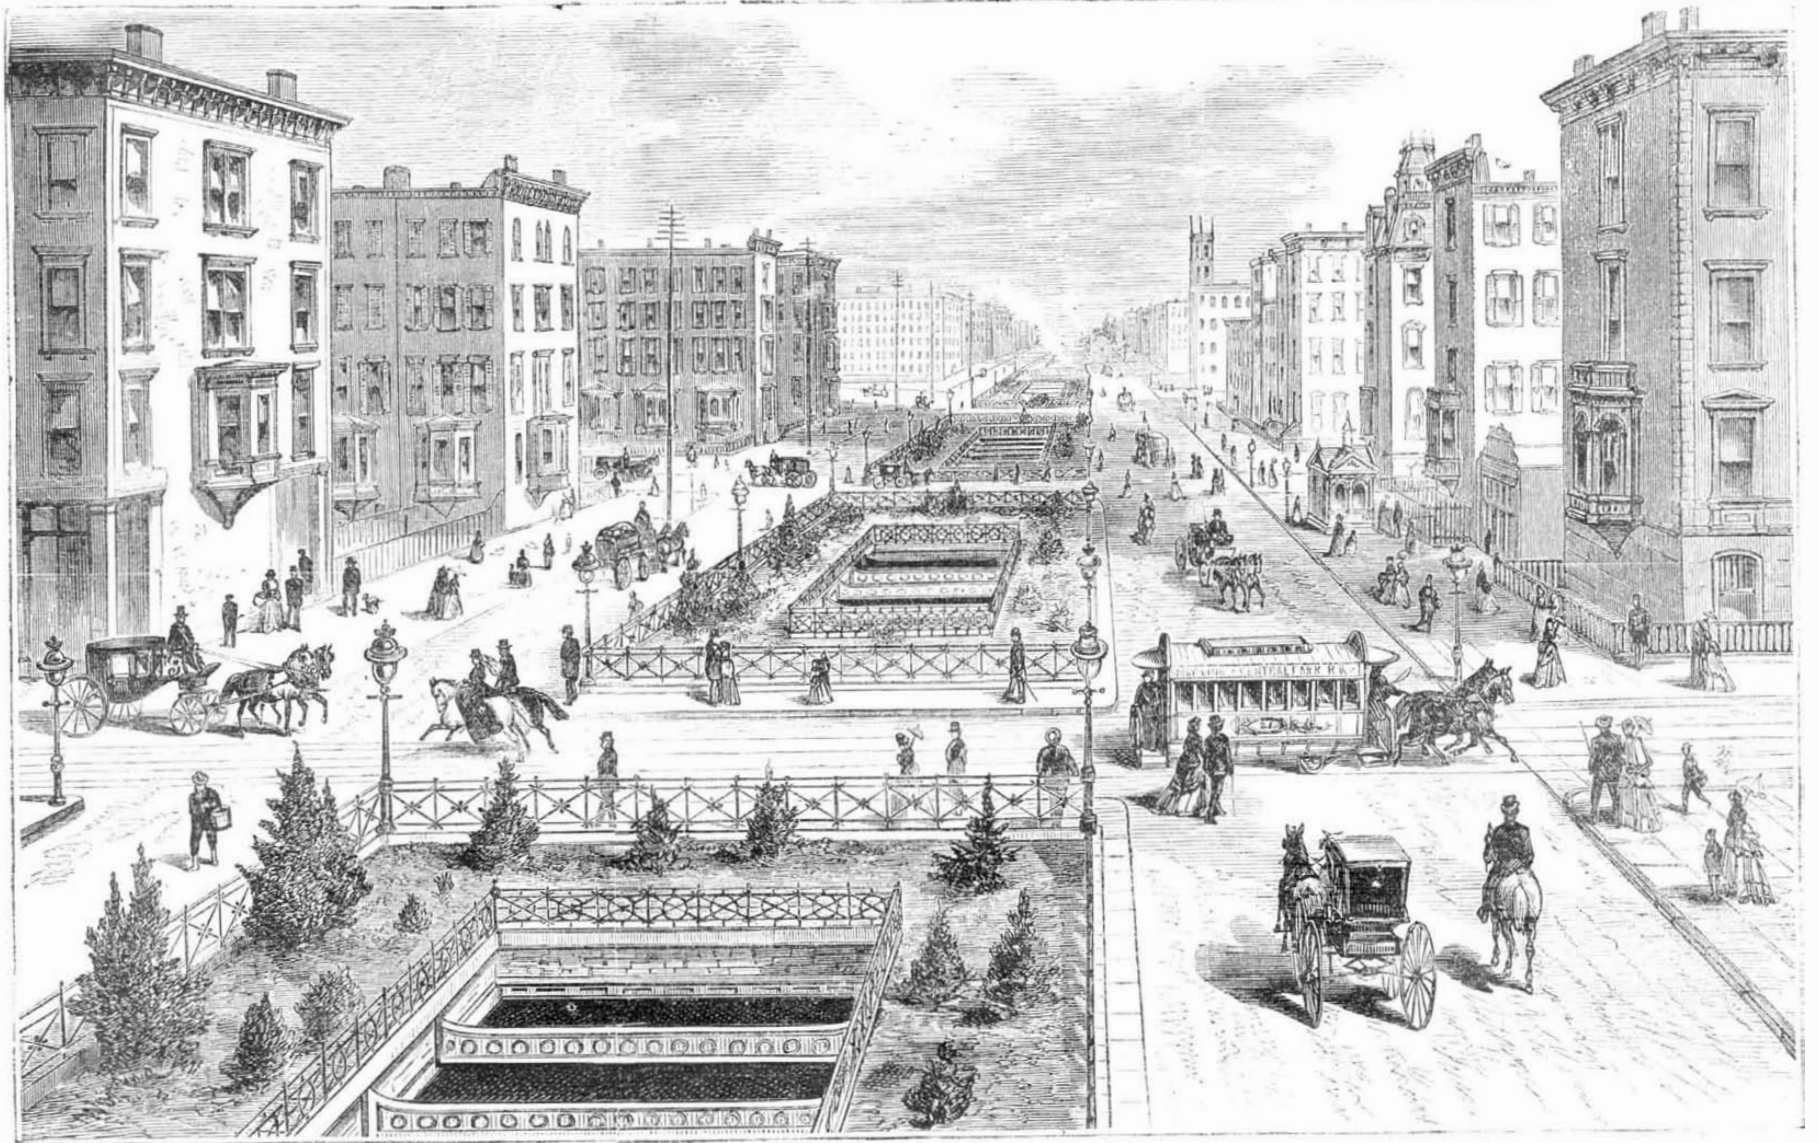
THE UNDERGROUND RAILWAY. NEW YORK CITY.—BEAM TUNNEL OPENINGS ON FOURTH AVENUE, 59th TO 76th STS.
